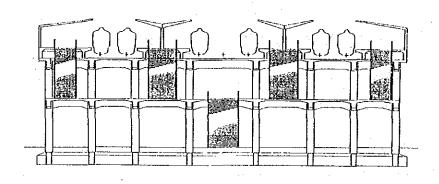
Conceptual Plan of the Elevated MG Station
